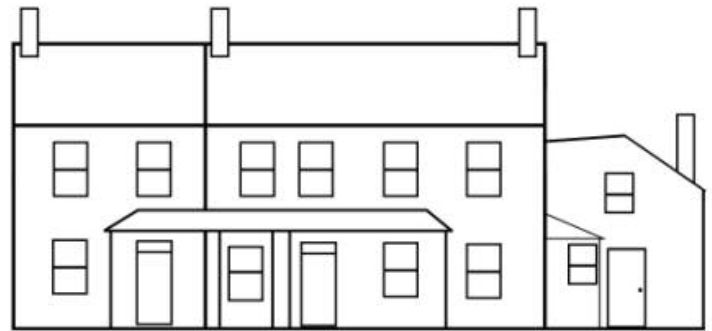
Elevation of house following rebuilding of porch on west elevation and building of octagonal bay.
